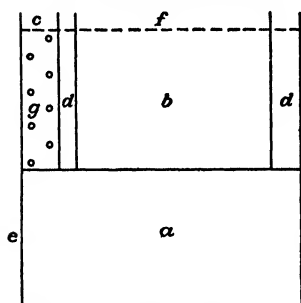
Vertical section of drift for overhead stoping, Monson, Me. *a*, drift; *b*, 10-foot slate bed; *c*, 2-foot slate bed; *d*, quartzite beds; *e*, open vertical seams; *f*, horizontal roof seam; *g*, drill holes for blasting.
